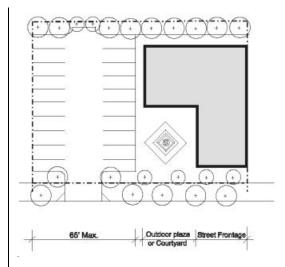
Figure Exception to 20.50.240(A)(1): Example of reduction of the building frontage in order to create an outdoor plaza.
